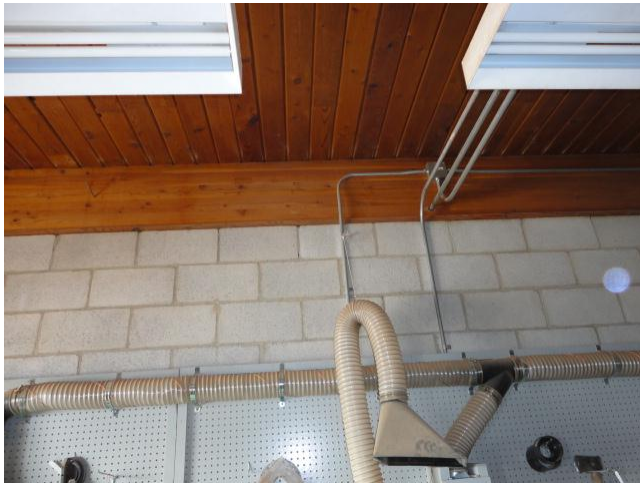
Install surface mounted conduits along top of CMU wall, then up and through the glu-lam beam (to match existing) from the Carpenter Shop into the Radio Shop.
